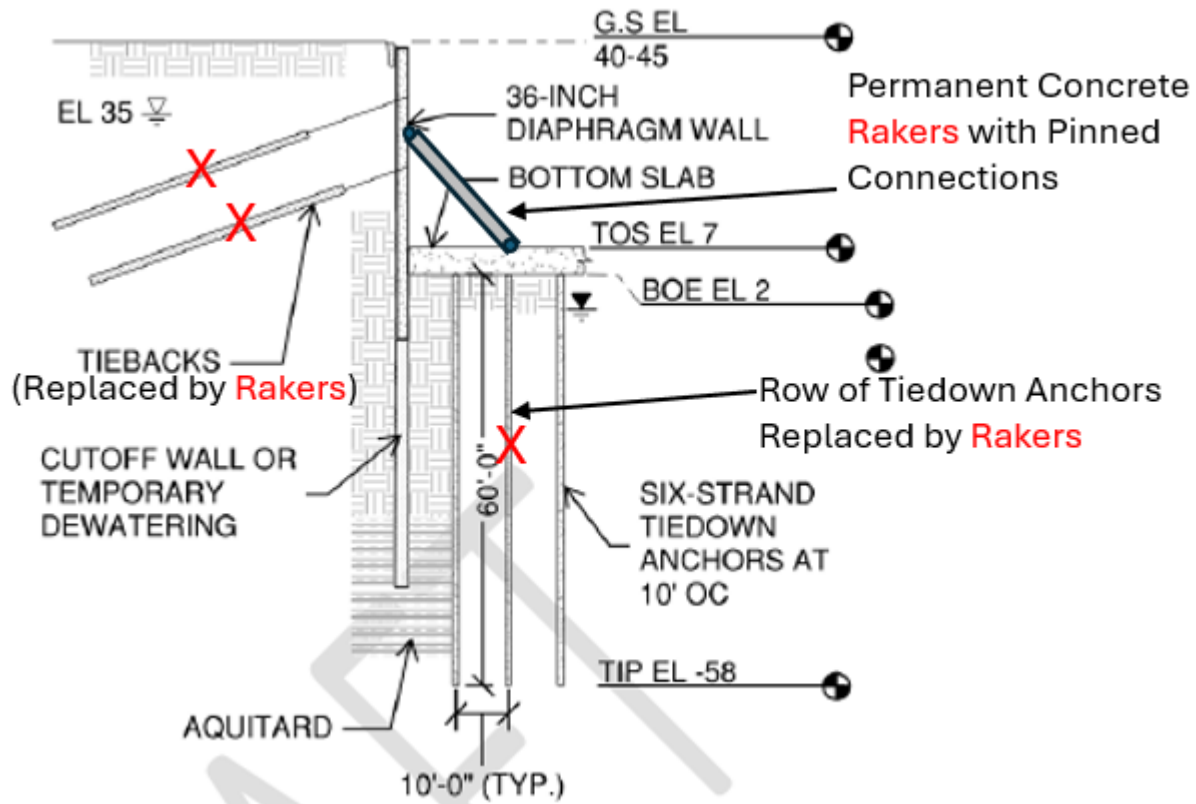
Alternate Surge Basin Wall Configuration with Permanent Concrete Rakers Replacing the Tiebacks and Replacing Some Perimeter Tiedown Anchors
